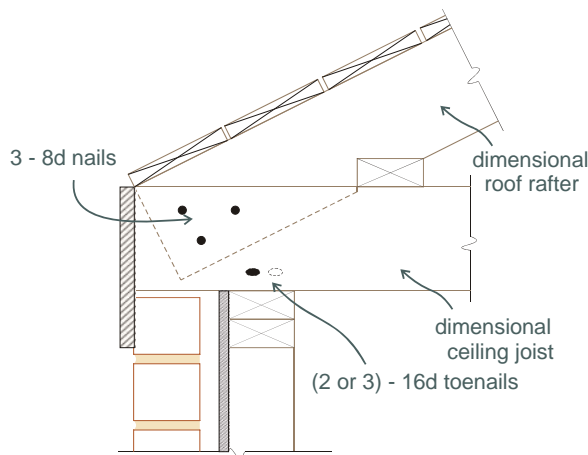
ROOF TO WALL CONNECTION DETAIL
